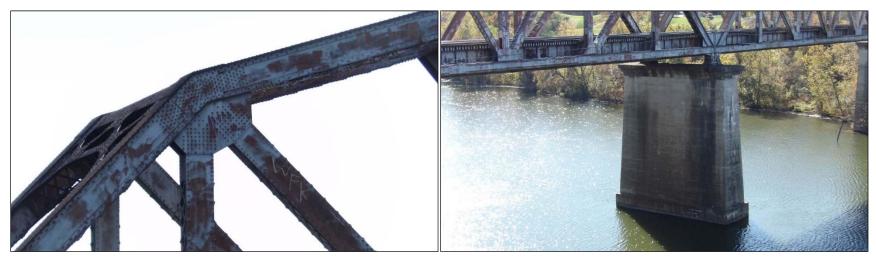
CLOSE-UP OF THE RIVETED CONNECTIONS ALONG THE TOP CHORDS AT THE NORTHERN APPROACH (LEFT); CLOSE-UP OF ONE OF THE POURED CONCRETE SOLID-WALL PIERS, LOOKING SOUTHEAST (RIGHT)
